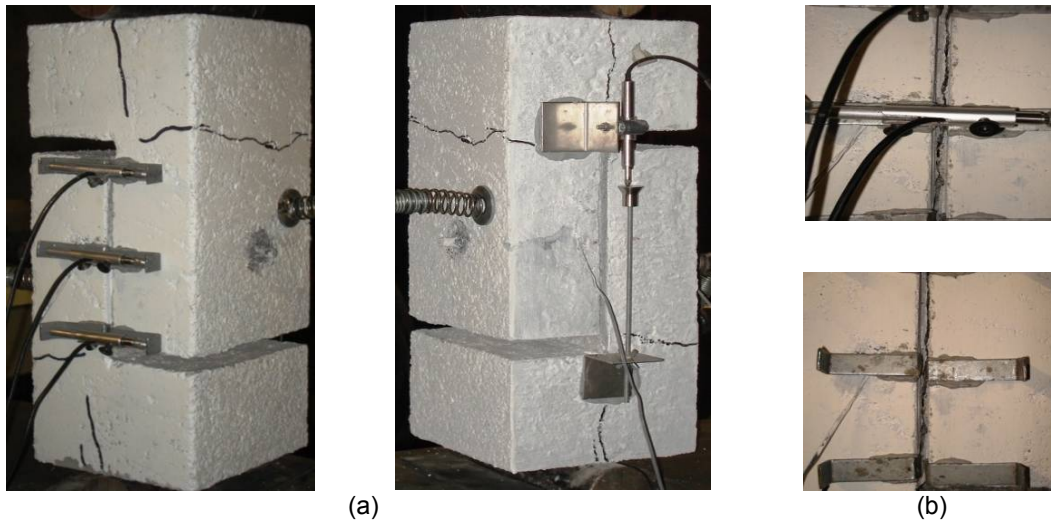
Cracks (a) outside and (b) in the notched shear failure plane
